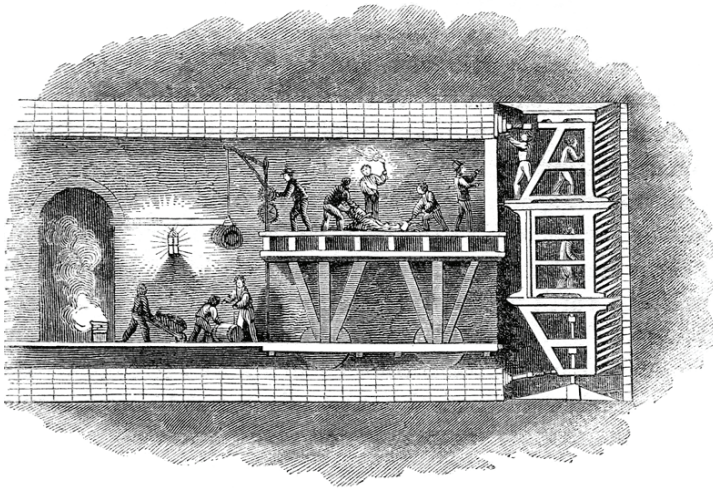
Brunel’s tunnel shield. Marc Isambard Brunel developed this tunnel shield technology to build the first subaqueous tunnel beneath the Thames River (1821-1825). Brick walls were built at the faces of the tunnel and held in place while alternate shields were pushed forward 6 inches. The completed tunnel was 38 feet wide and accommodated two carriageways. SOURCE: http://en.wikipedia.org/wiki/File:Thames_tunnel_shield.png (accessed June 27, 2012). Public Domain.
